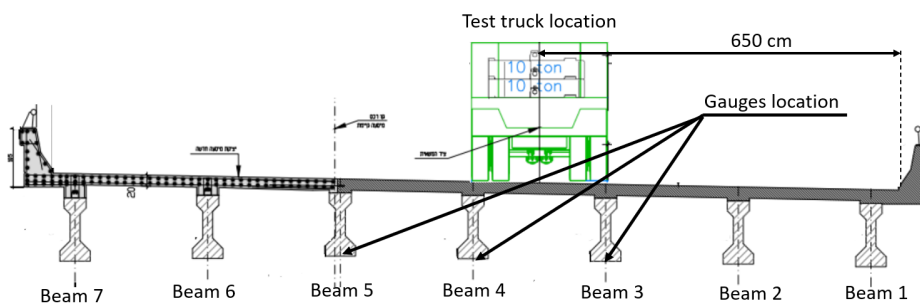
Location of live load test and the gauges used to measure the deflection of the beams shown on a transverse section of the bridge.
